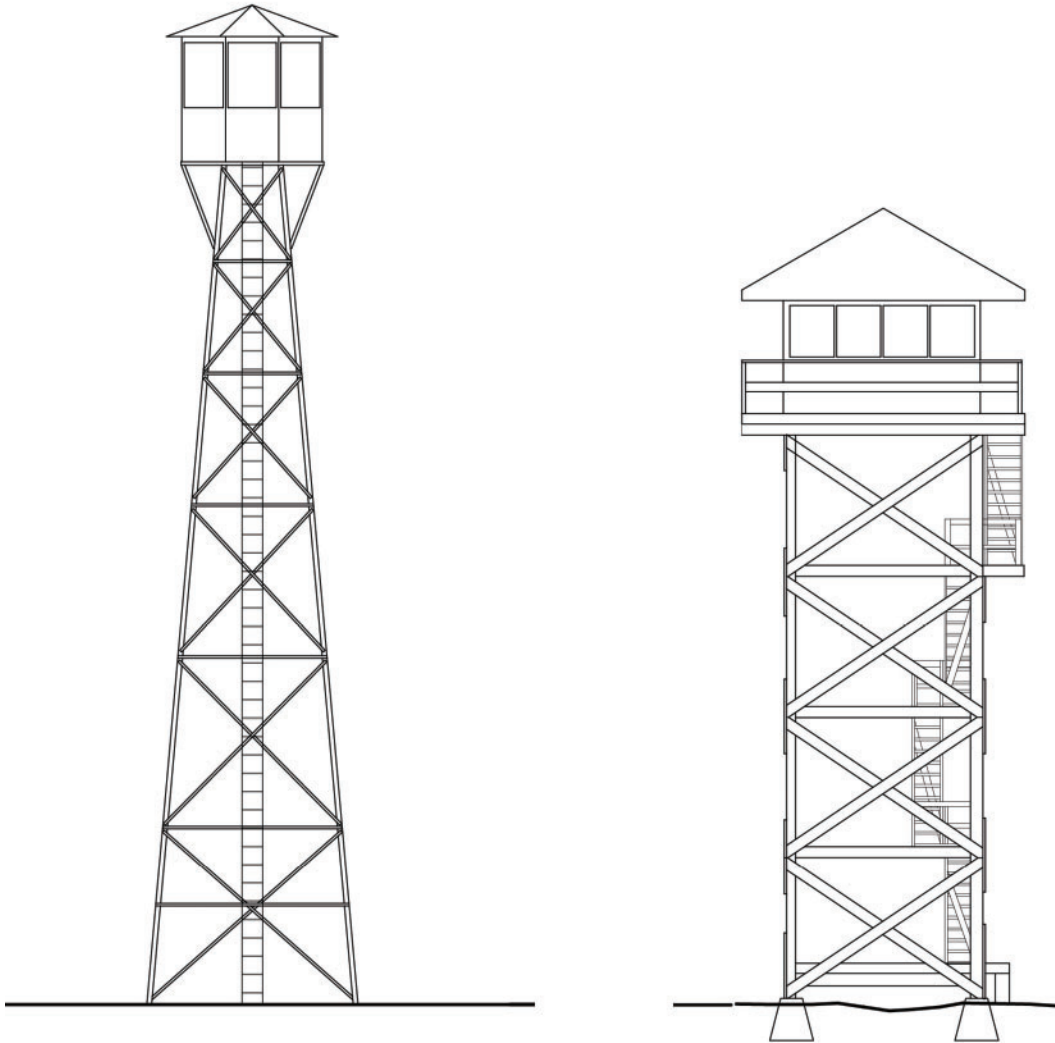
1:100 18m (60') Steel Tower (left), 1:100 12m (40') Wood Tower (right)
